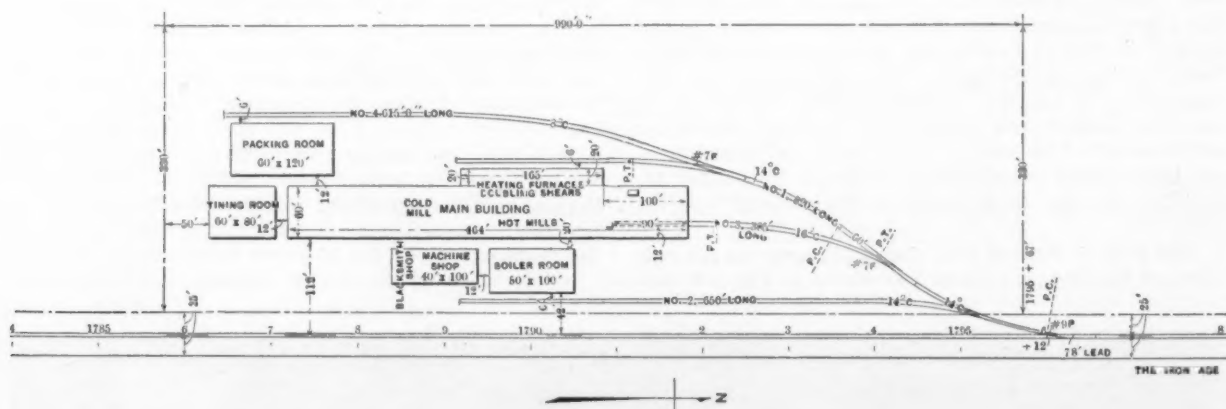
Ground Plan of the Atlanta Tin Plate & Sheet Mill.
